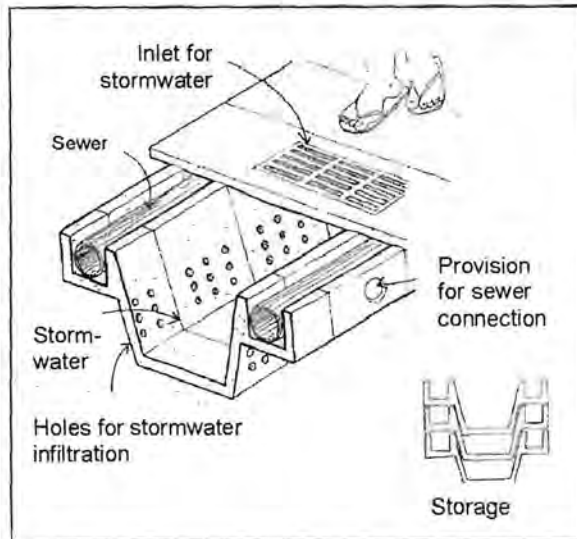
An innovative design for a pre-cast paving block that incorporates water, sewage and stormwater under the travelled way (Source: Duarte et al, 1996).
